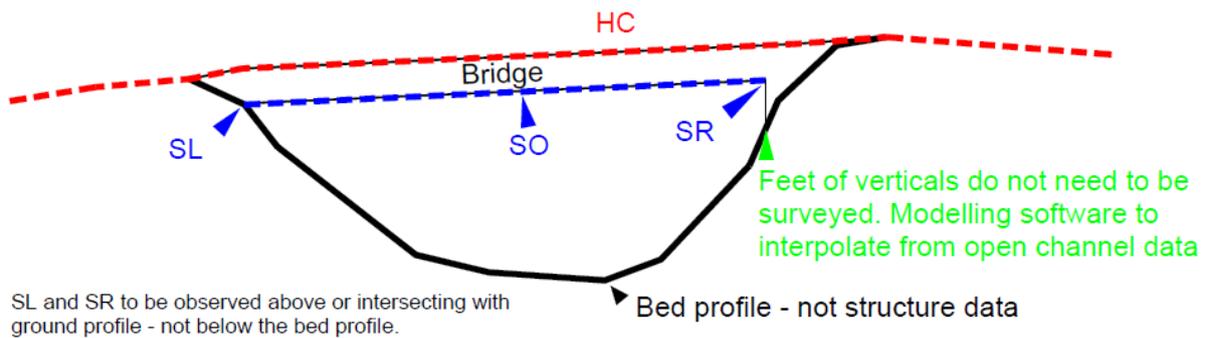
Definition of structure openings and high chord for a flat-deck bridge
